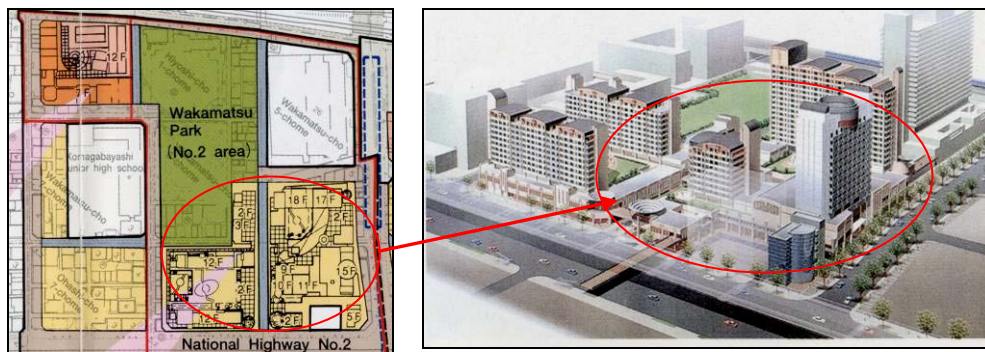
(a) Area No. 2 Plan and (b) As-built drawing for second project (Note: the existing Joy Plaza structure is located in the top right of both figures)
